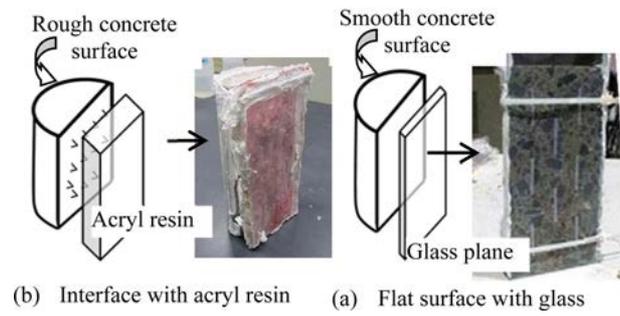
Specimens layout for direct visual observation of water flow through concrete crack.
